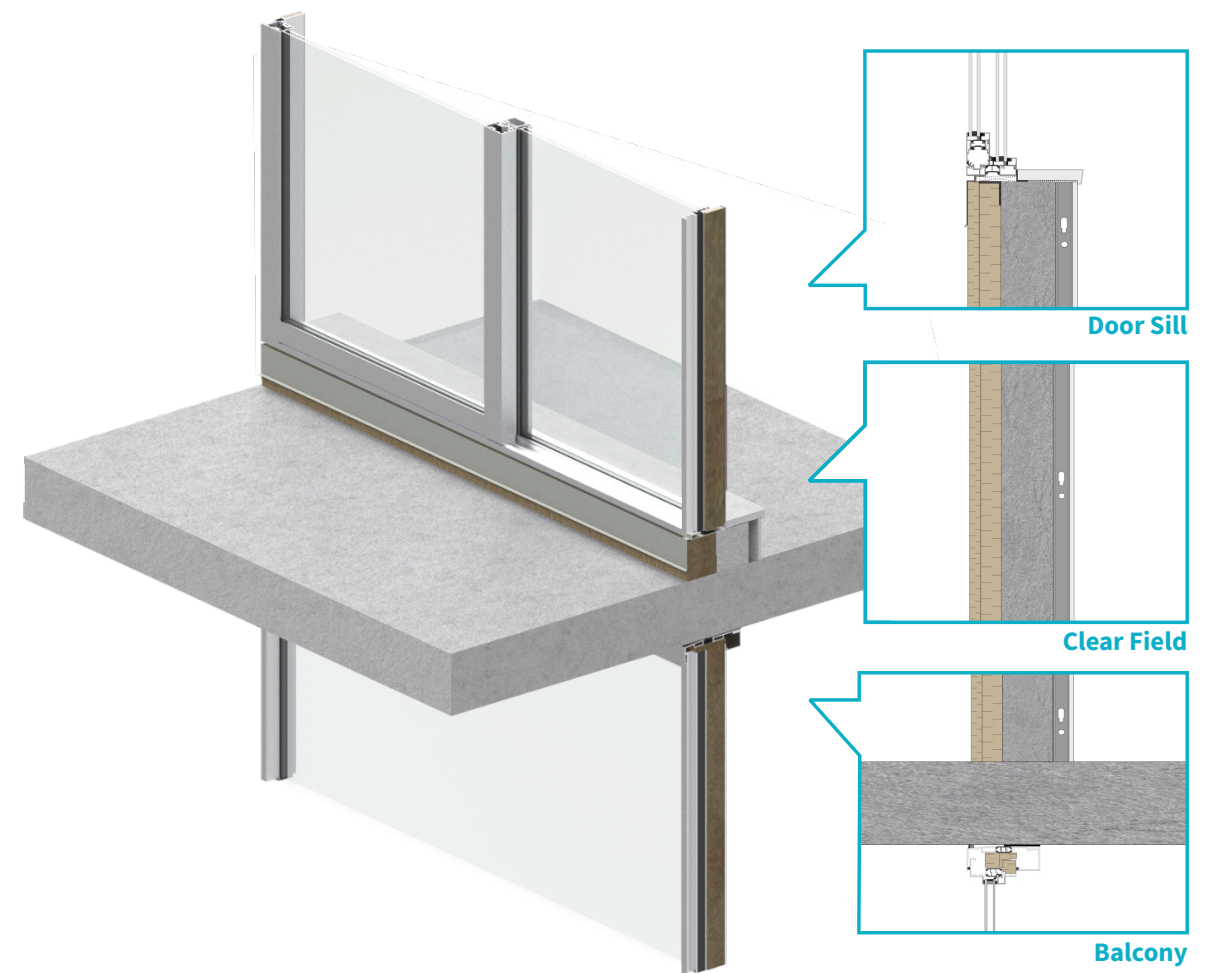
3D render showing overall balcony and door section, and the approach using separated details for an insulated concrete curb
